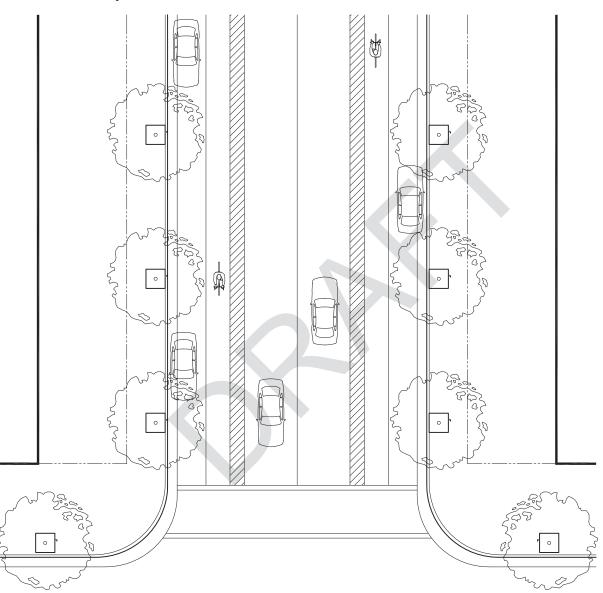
Street Type 4.2: Typical Intersection (Plan Perspective) [Update pending]
